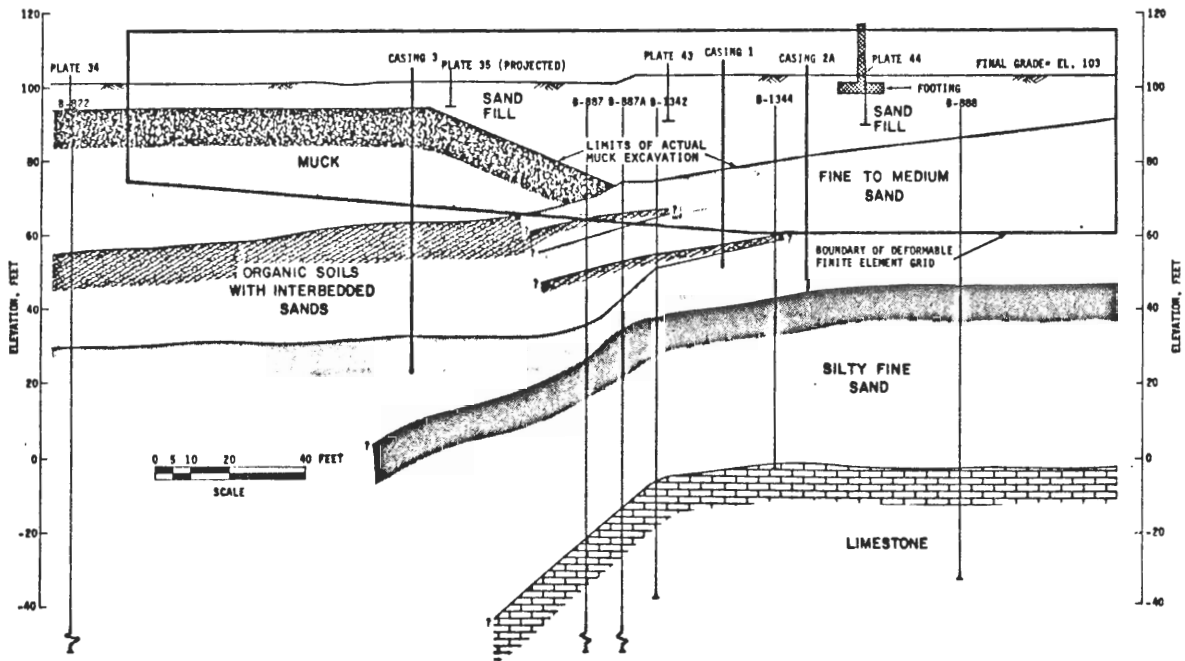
Subsurface Section Showing Locations of Borings, Incliner Casings, Settlement Plates, and Building Foundation
